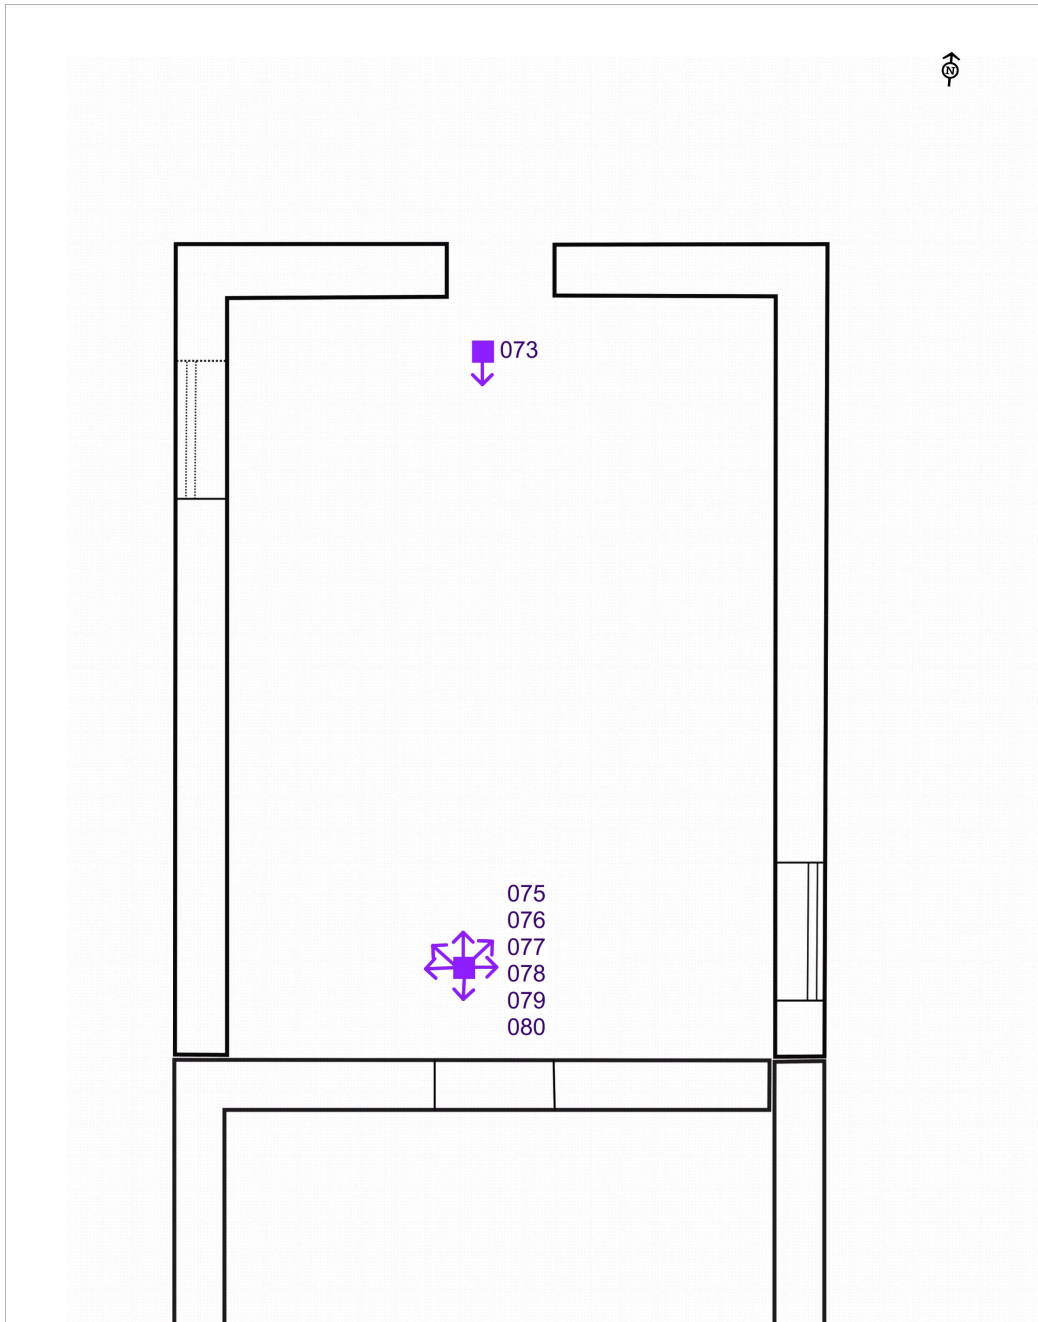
Location of photographs inside the first floor of the cow house within the Llan y Nant Barn complex. The first floor was inaccessible, and these photographs were taken from below through holes in the floor.
